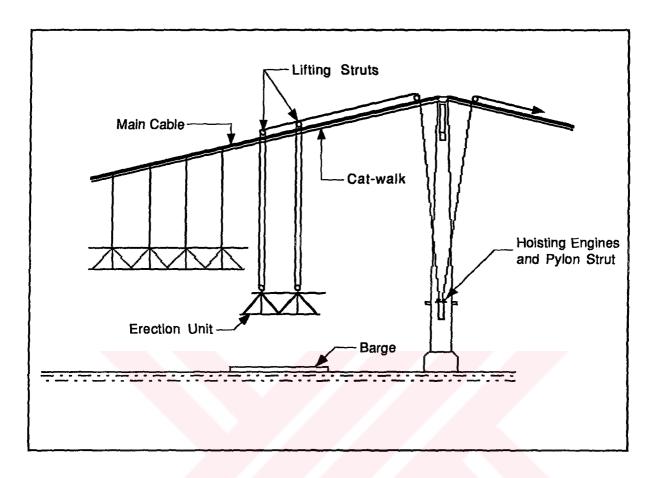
ARRANGEMENT OF LIFTING STRUTS AS USED IN THE VERRAZANO NARROWS BRIDGE
